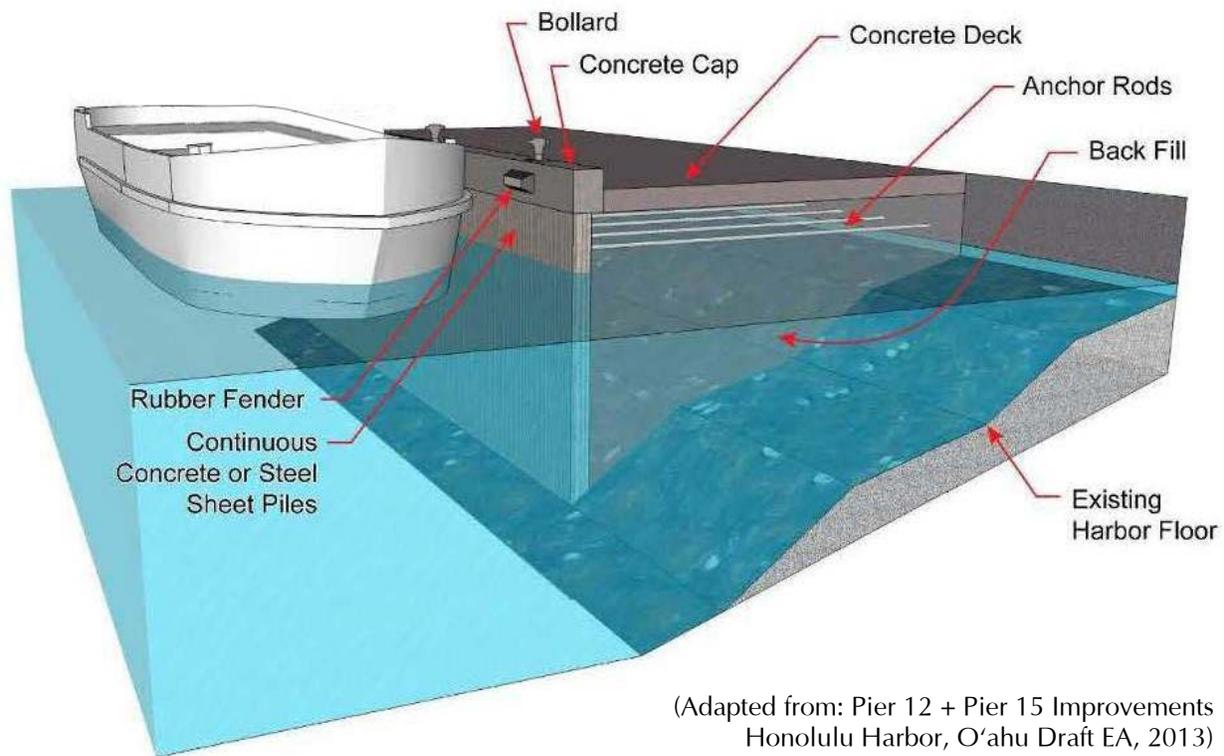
Continuous Bulkhead with Sheet Piles and Backfill (Alternative Design Concept C)
